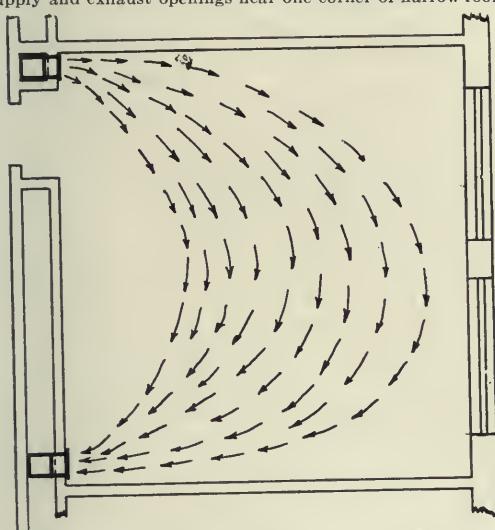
Plan of schoolroom showing effect of locating supply and exhaust openings at inner corners.
